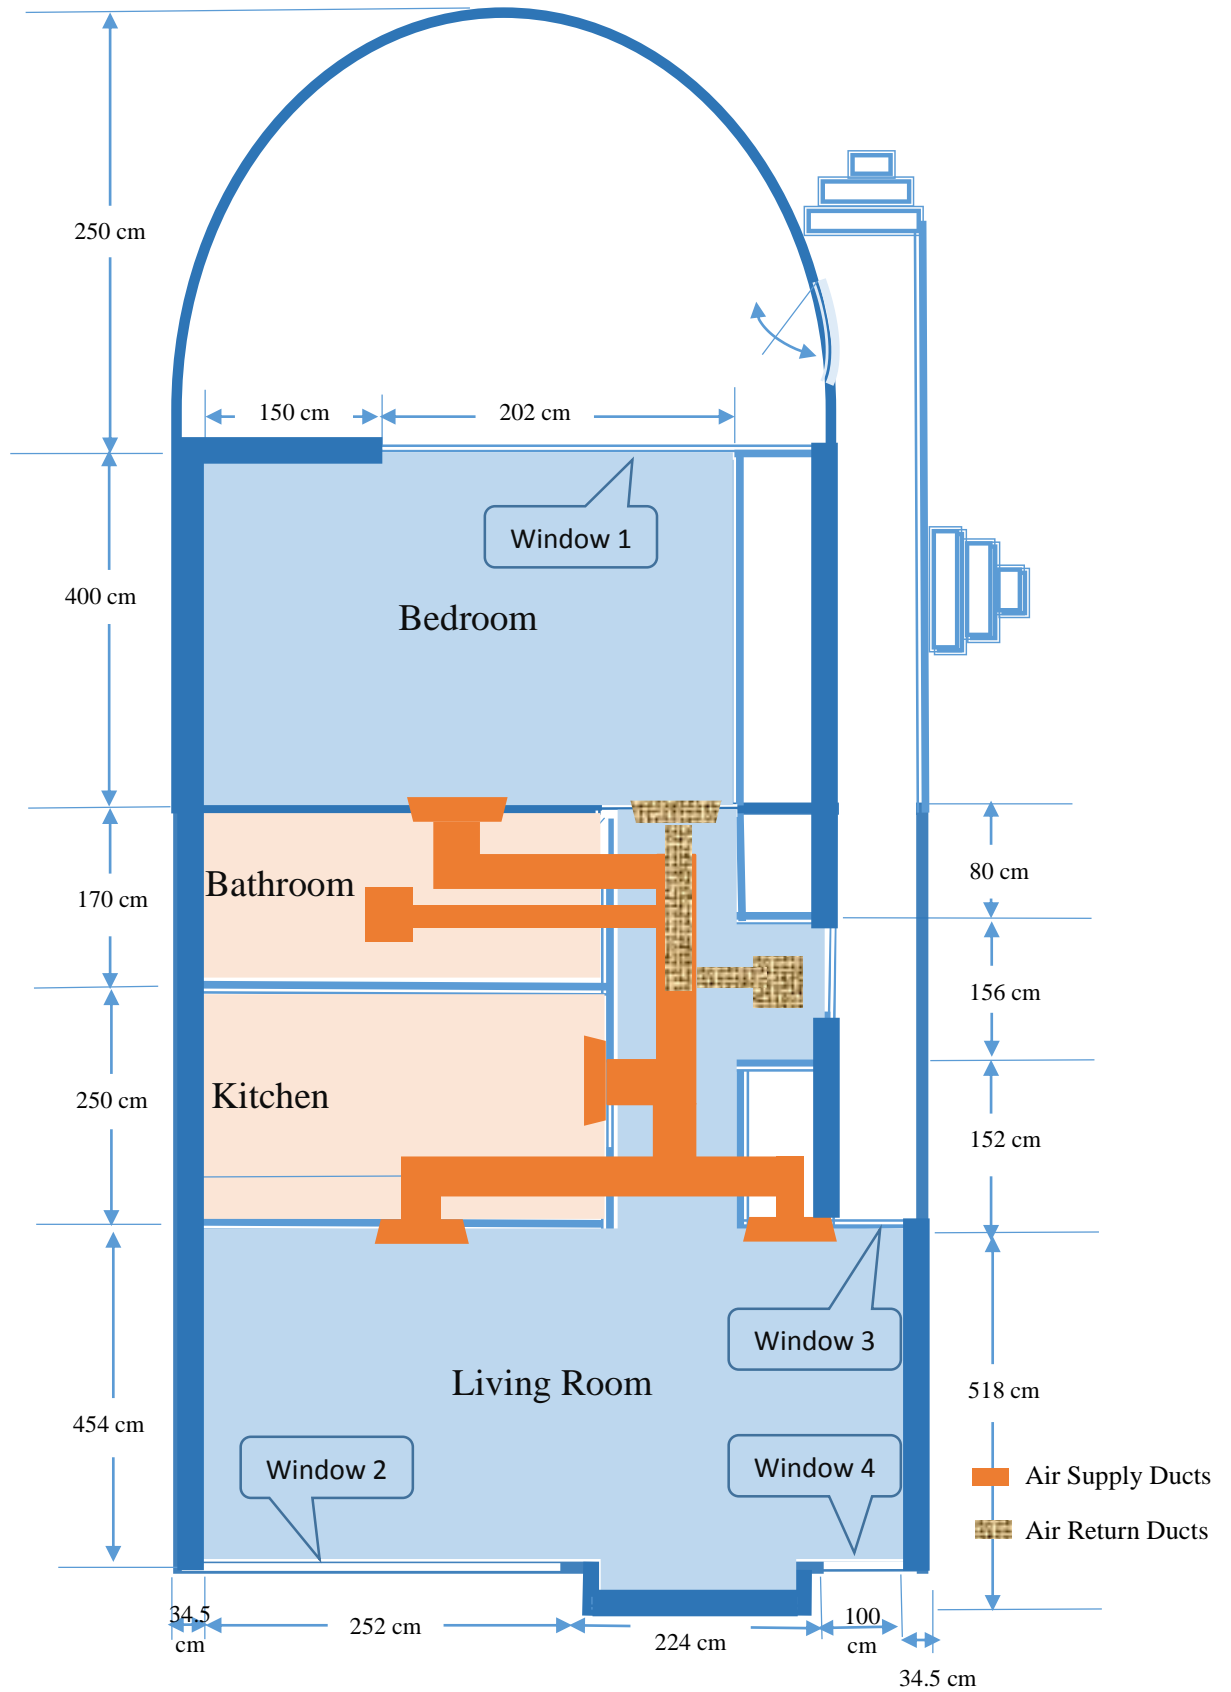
Ducts Plan for 3305 and 3307 Houses
